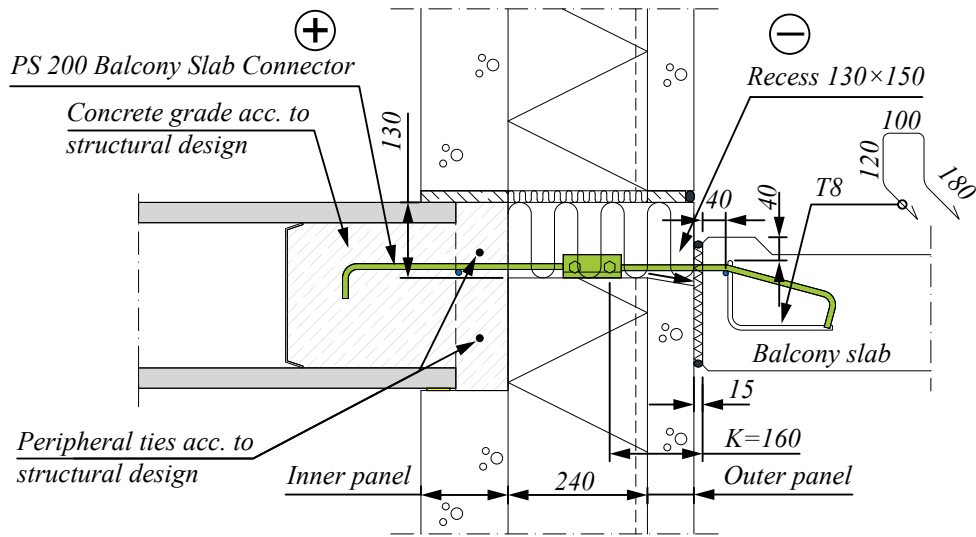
Balcony Slab Connector PS 200 on a load-bearing wall.
